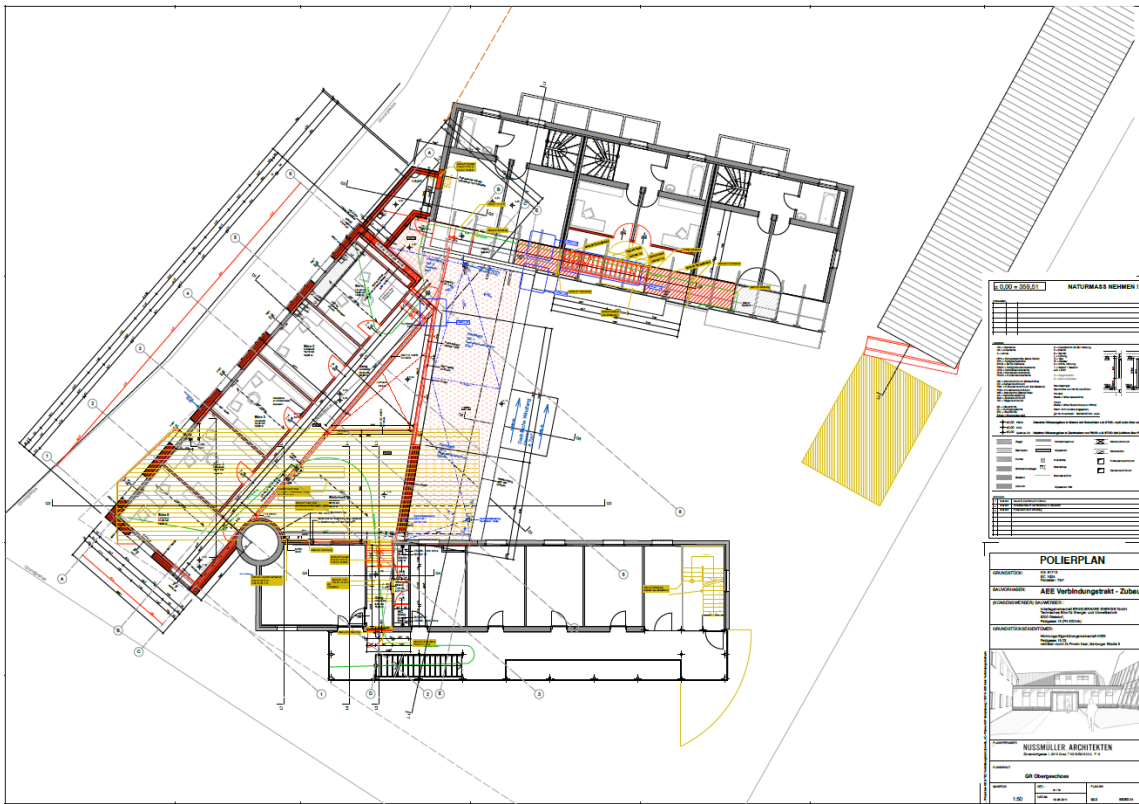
Second floor of the connection building of office south and office north (Source: Nussmüller Architekten)
